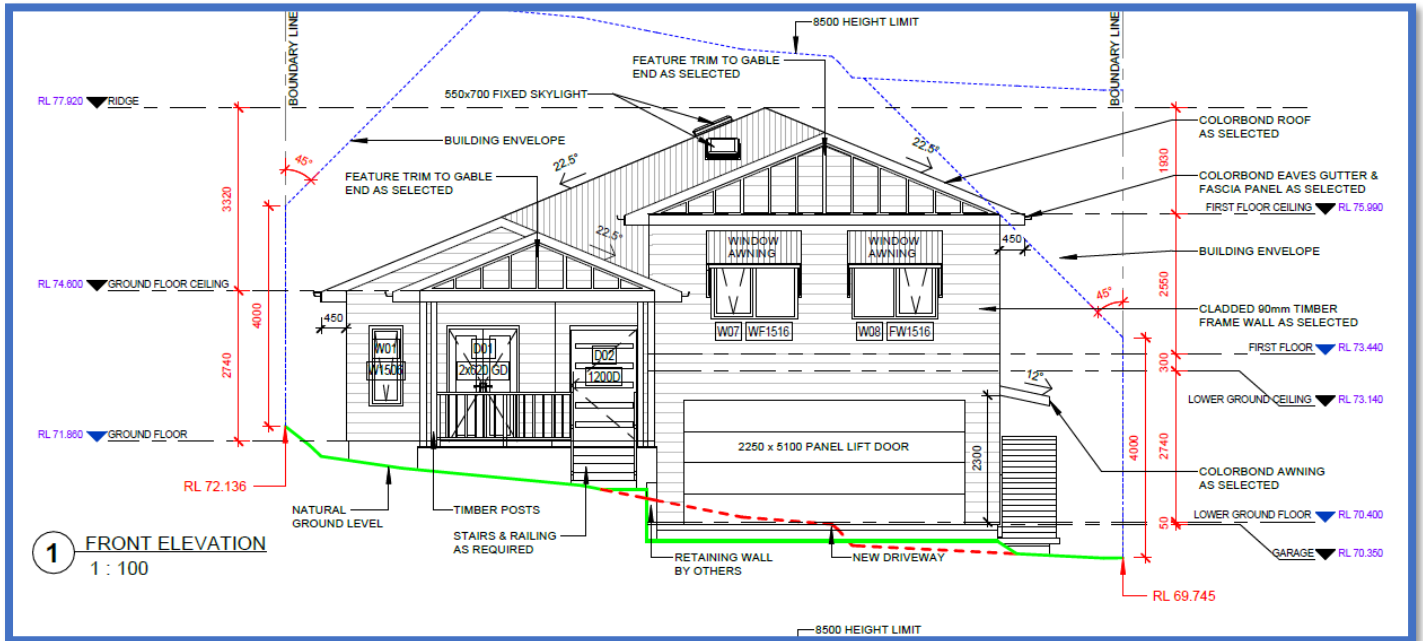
View of the proposed dwelling as seen from Dorrigo Avenue.
